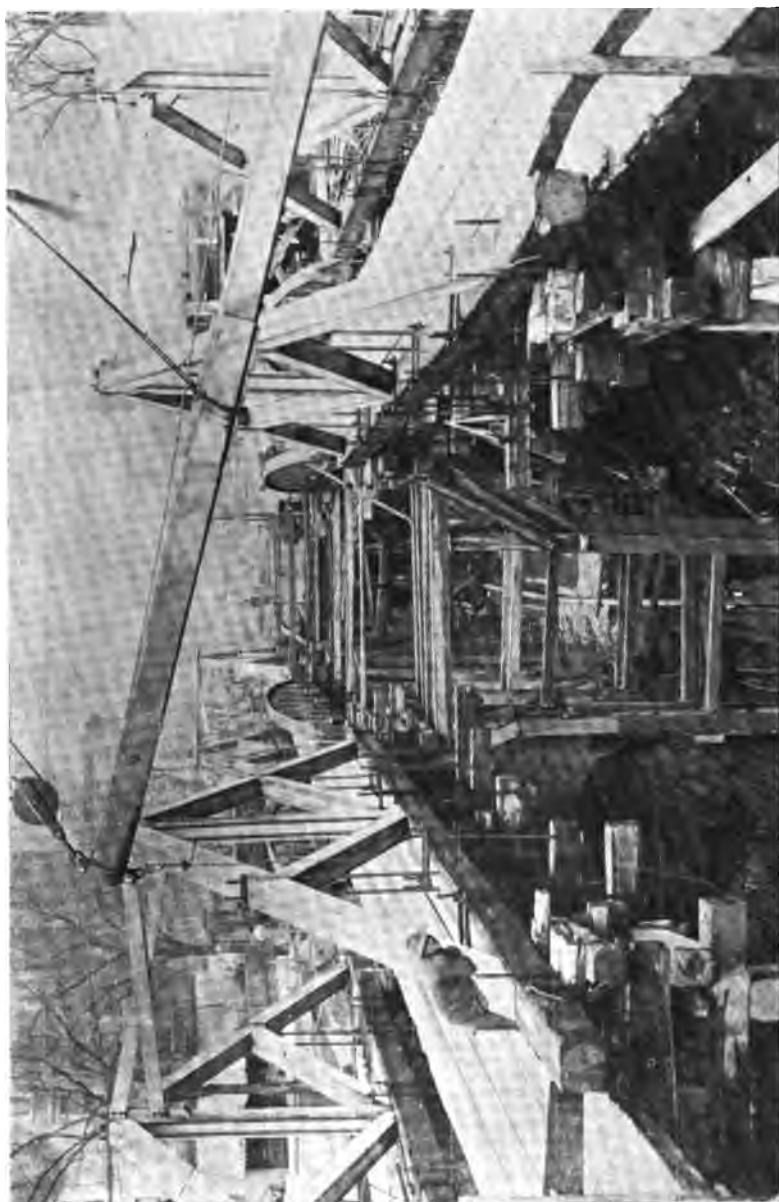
Trusses supporting Street Railway Tracks during Construction of New York Subway.
